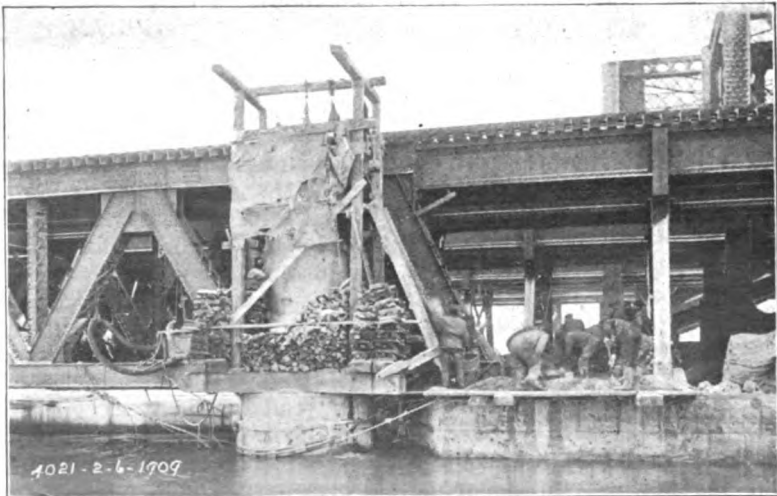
Sinking Cylindrical Pier—At Rear of Masonry Pier, Bridge No. 4.
